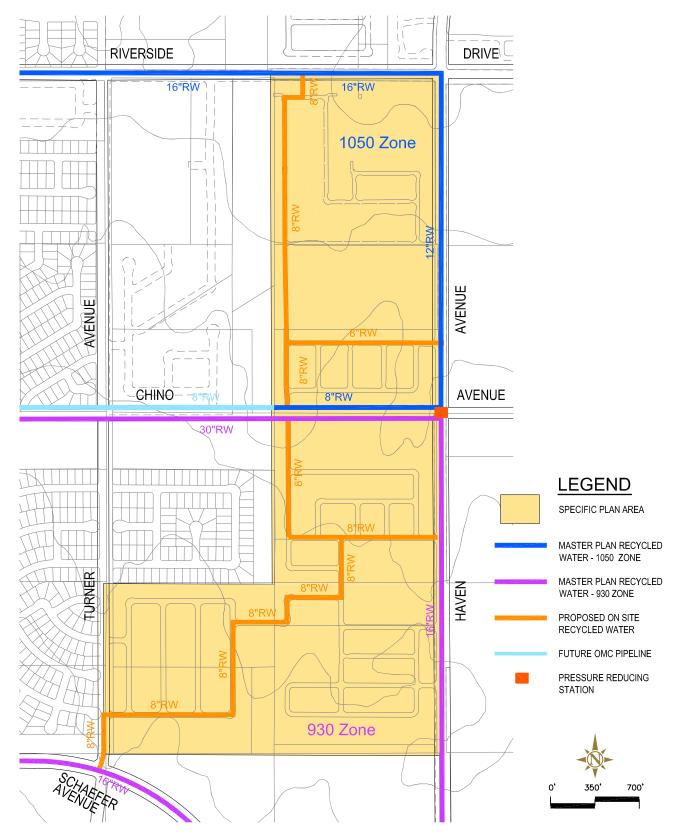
Conceptual On-Site Recycled Water System
